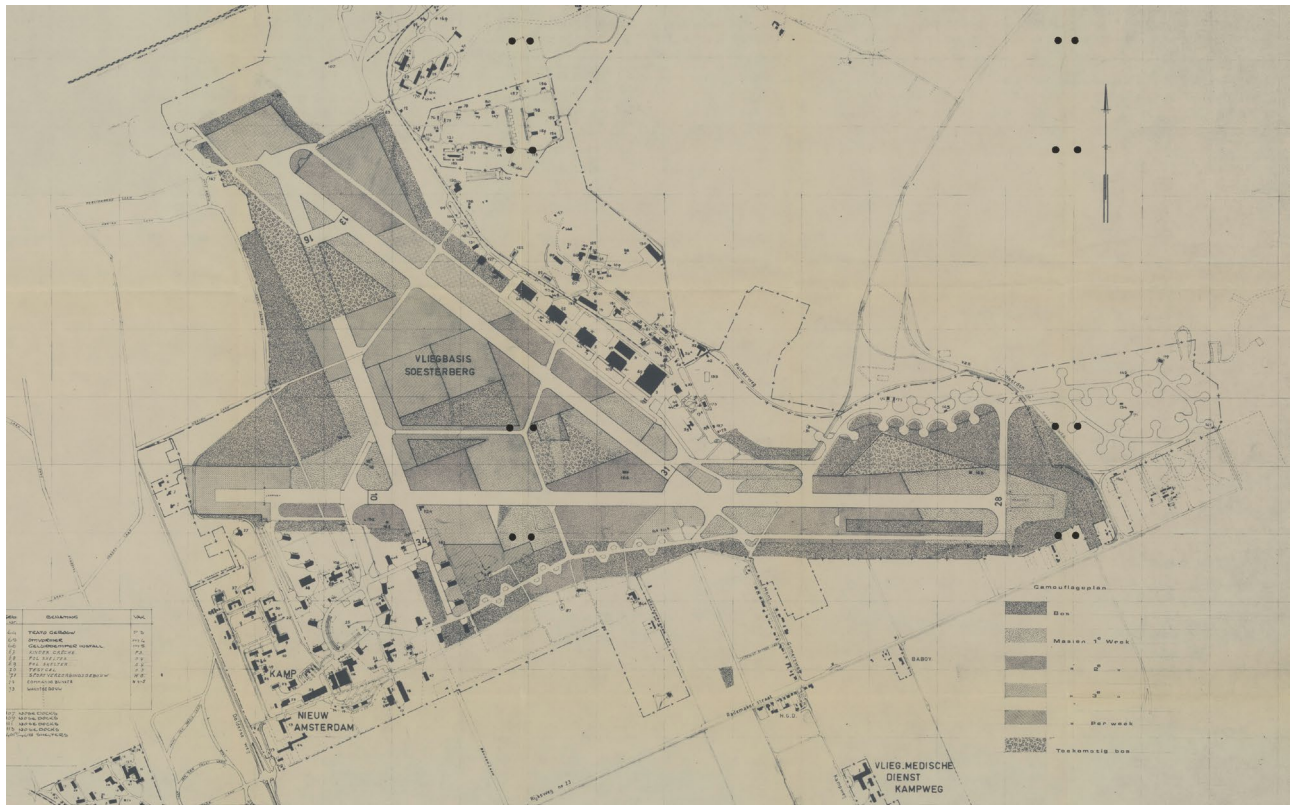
Camouflageplan & Construction drawings Aircraft Shelter, from Utrechts Landschap
